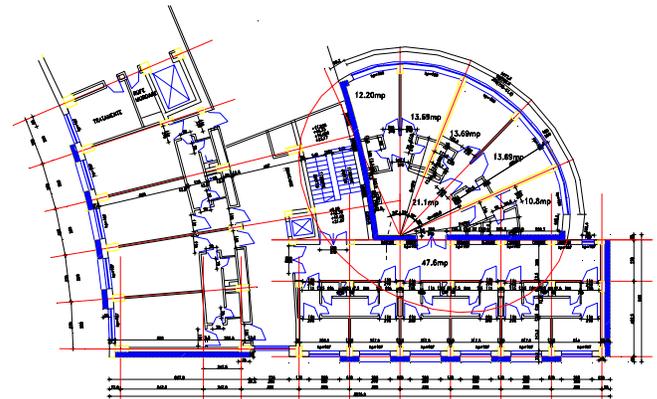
Architectural drawing of the building "C2" (strengthening solution by extension)
